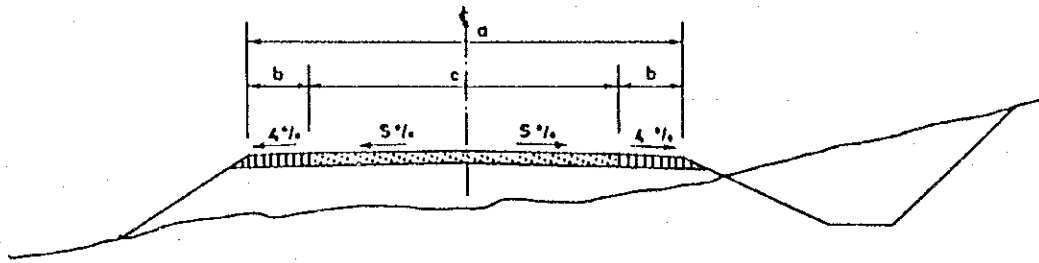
Cross Section Type II-VIII-Single Carriage Way
